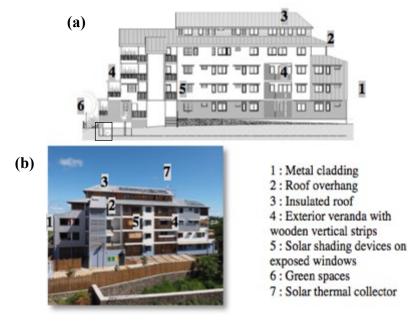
(a) South Façade and (b) North Façade of 'Niama', Saint-Pierre, Reunion Island [1]. Design: Coarchitectes. Photo credits: N. Peyrebonne.
